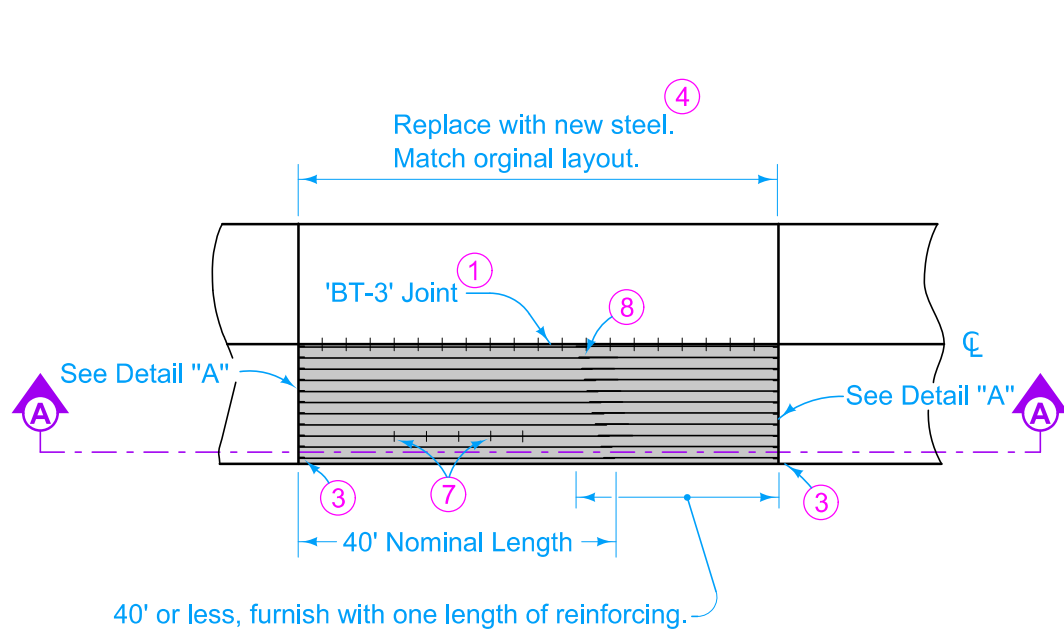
DETAIL FOR 'RT' OR 'RD' JOINT BAR SPACING
